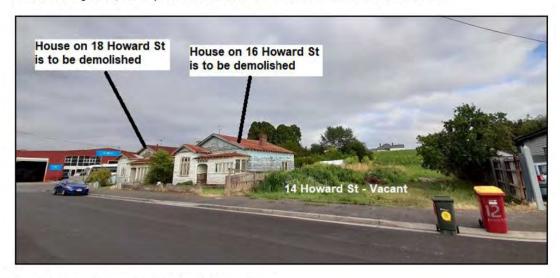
Looking North-west on to 14, 16 and 18 Howard Street
